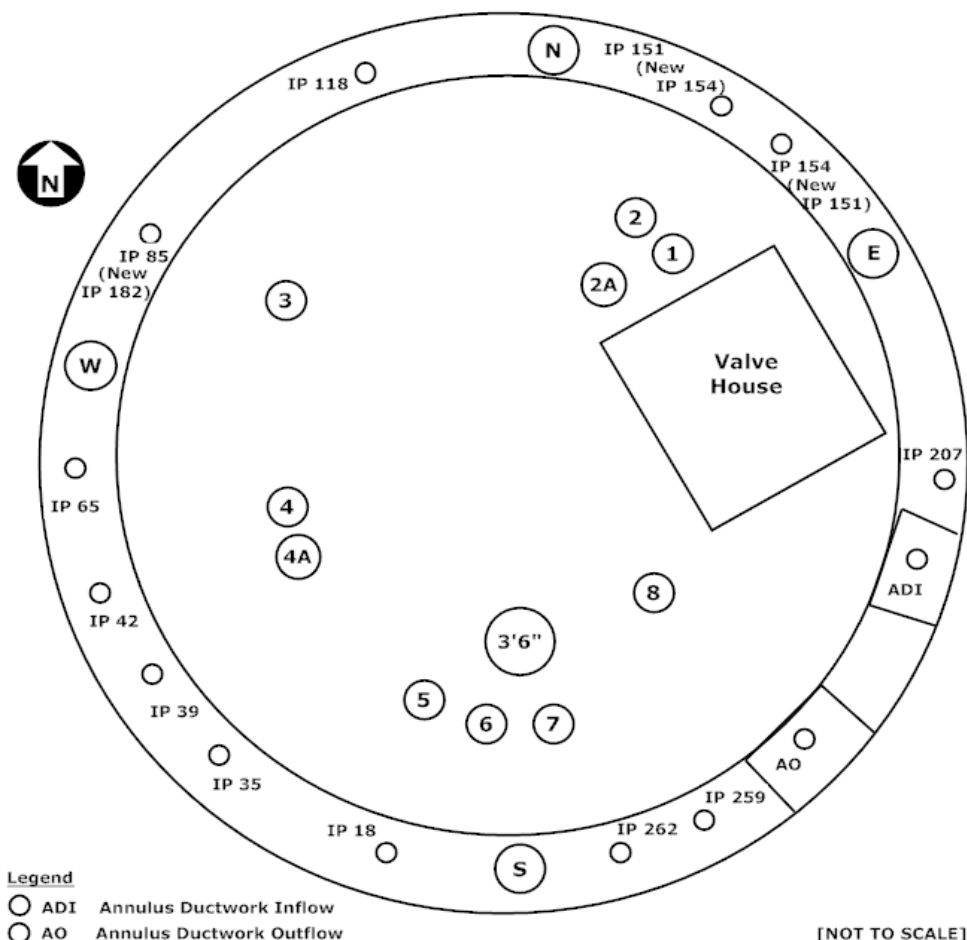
Type II Waste Tank Access Risers for Waste Removal Equipment Diagram
